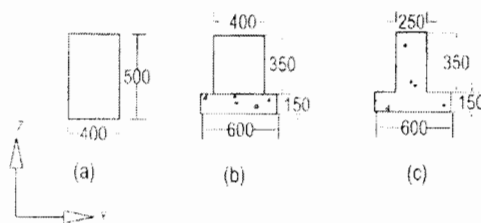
Three types of Foundation systems, (a) Rubble masonry wall foundation (b) Rubble masonry wall foundation with reinforced concrete (c) Inverted tee concrete foundation.
